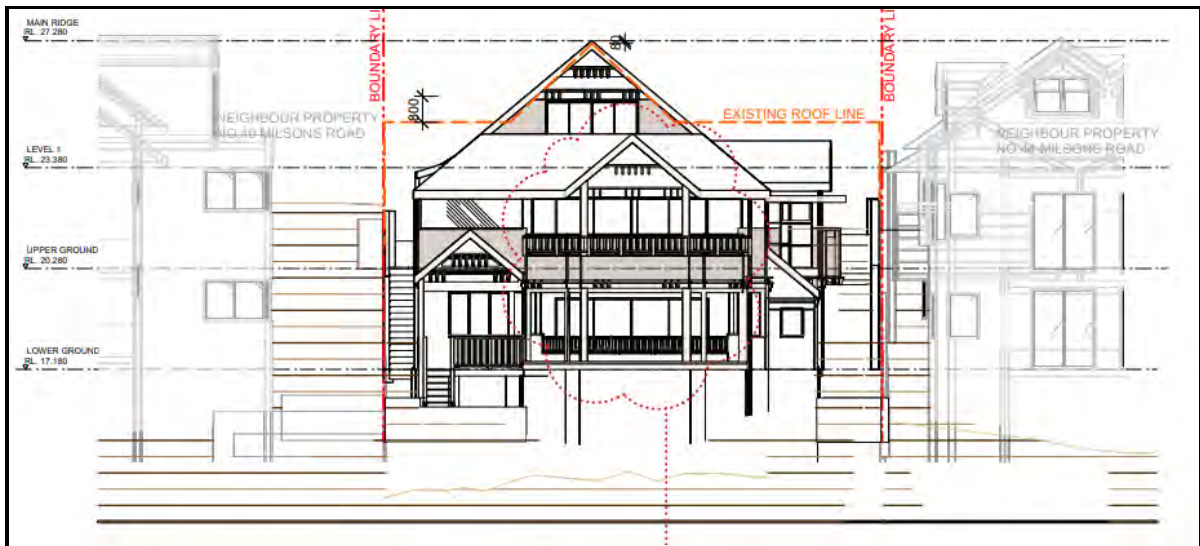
Proposed South Elevation, DA-A-201 Rev L
